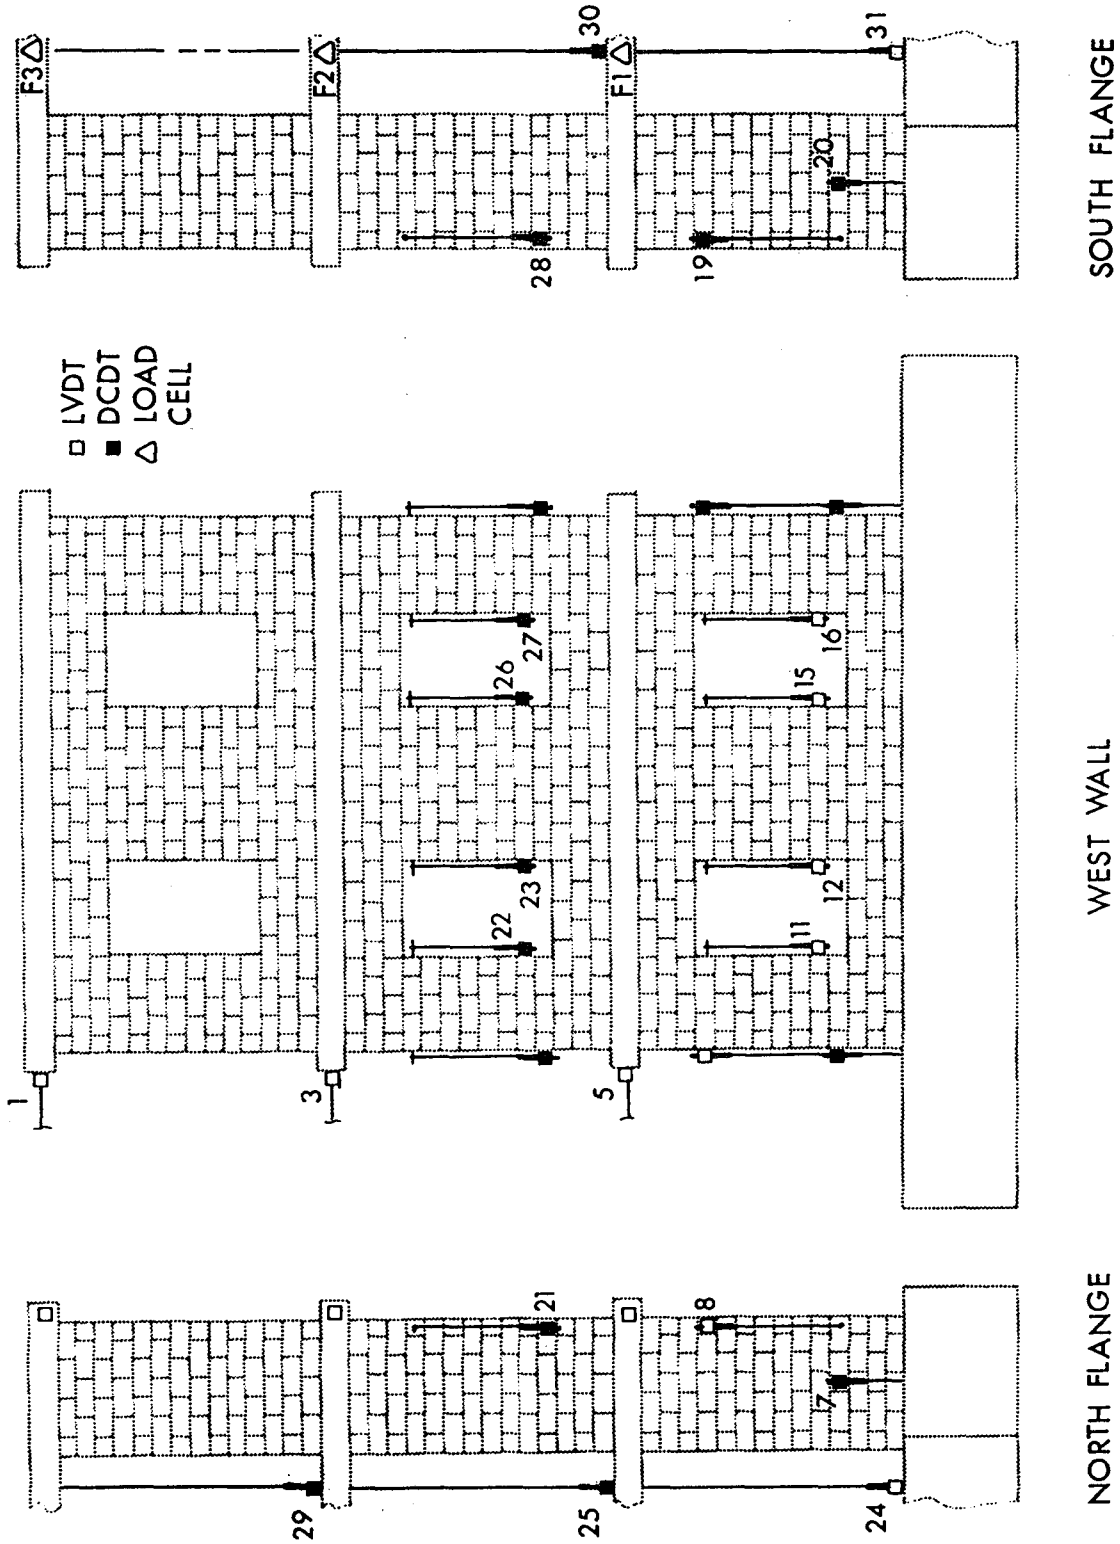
Layout of Instrumentation (RM2 - Static Test)
